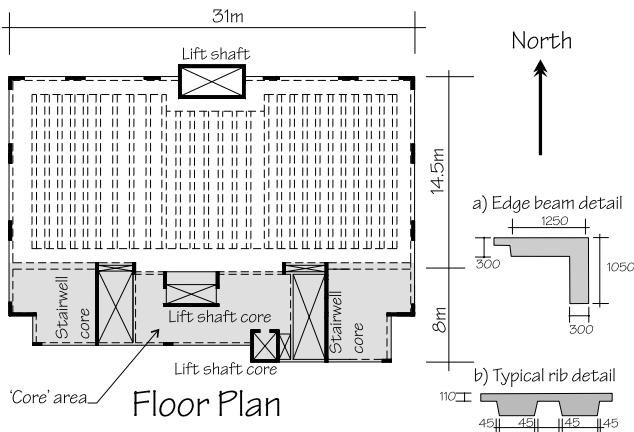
Layout of in-situ cast post-tensioned concrete floor which initially failed the CSTR43 vibration serviceability check.
